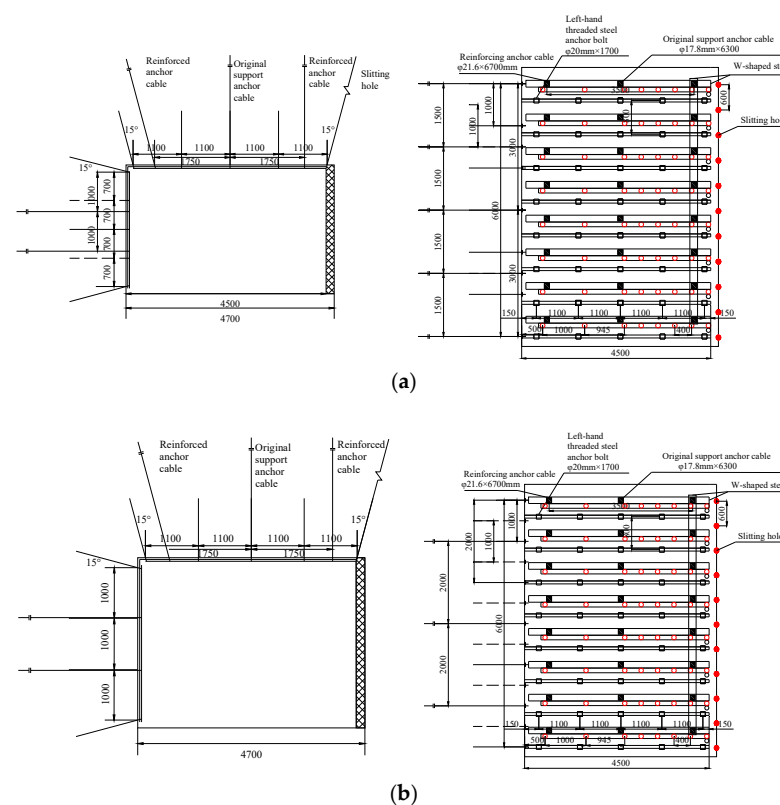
Design of roof reinforcement support for gob-side entry (a) 9102 tailgate roof reinforcement design (b) 10102 headgate roof reinforcement design.
